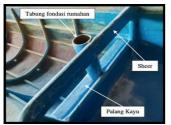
Pillar Foundation Pipe Source: Photo Rochyat 2022
